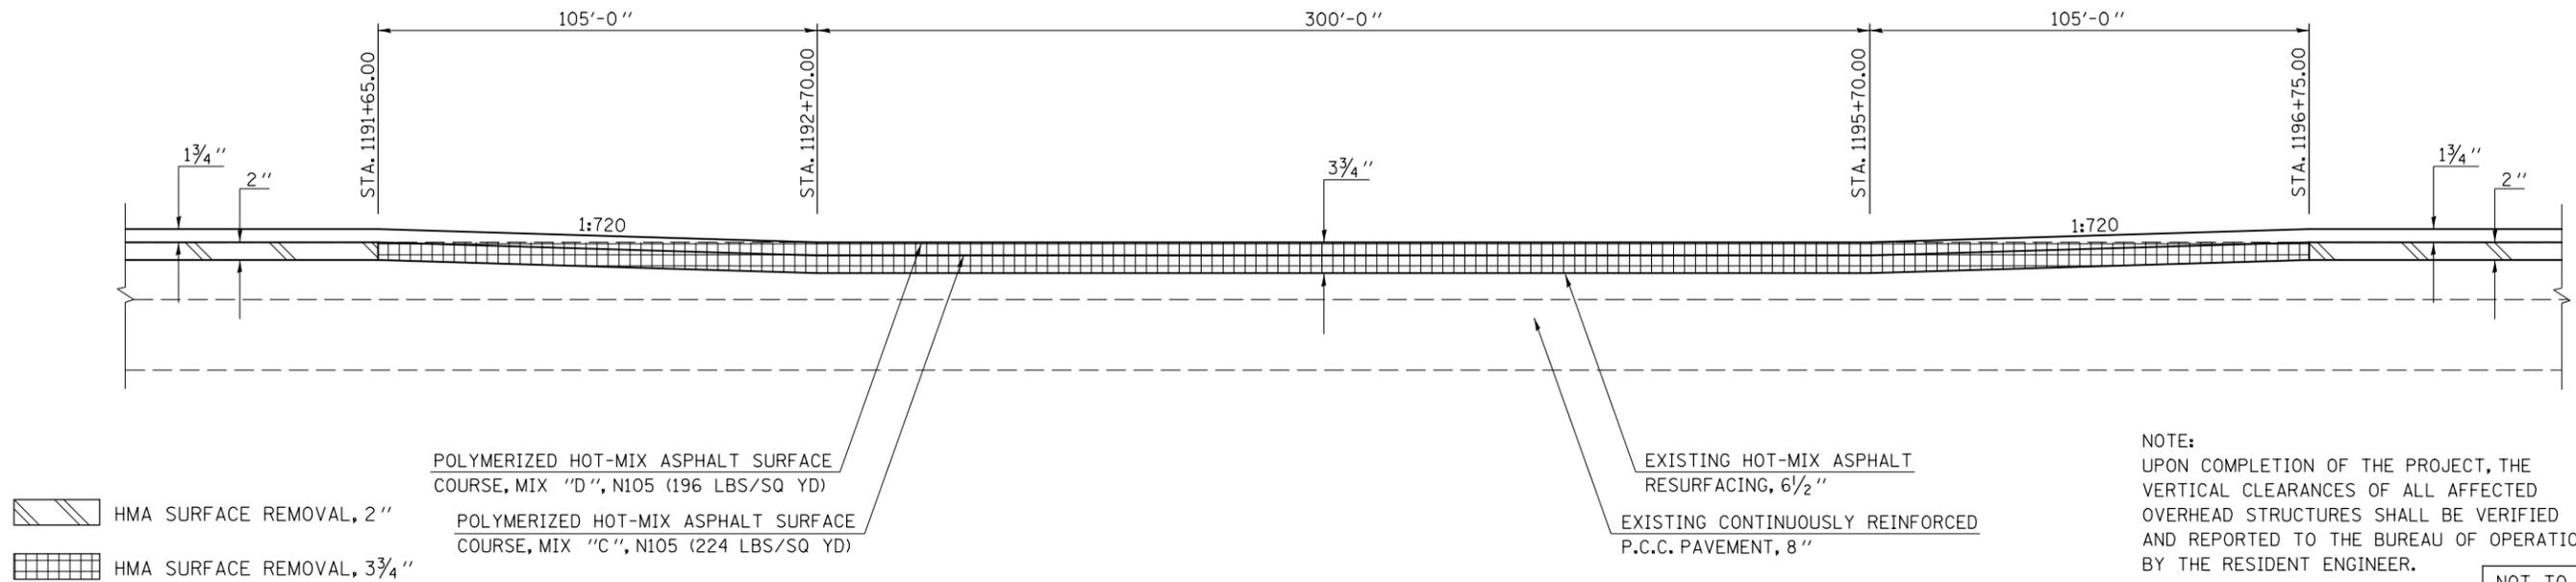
MILLING & PAVING TRANSITIONS UNDER S.N. 057-0130
